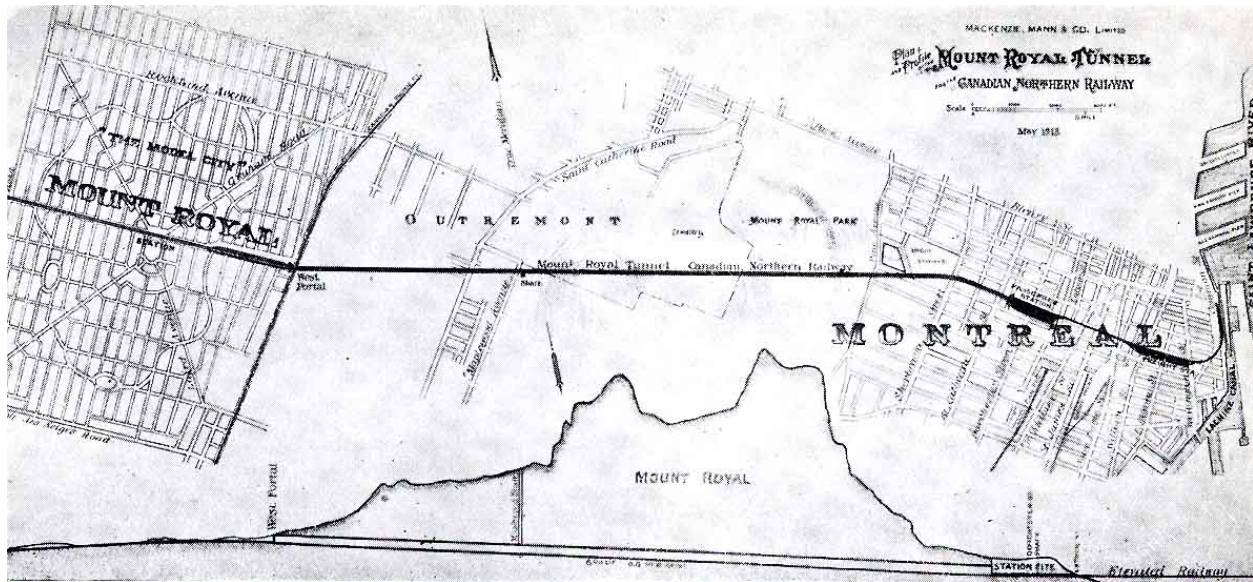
TMR - Layout proposed as a railway suburb to Montreal (1912)
